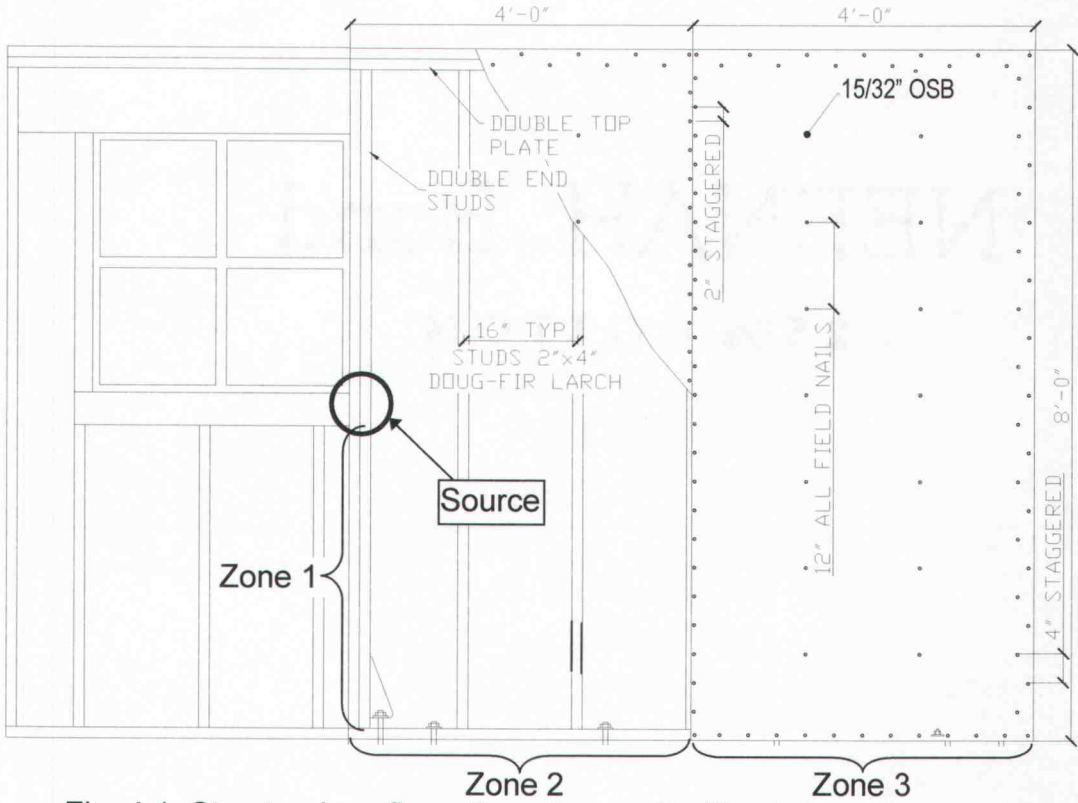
Structural configuration: shearwall with window where water enters at the window sill and runs down the stud (Zone 1) and along the sill plate (Zone 2 and 3).
